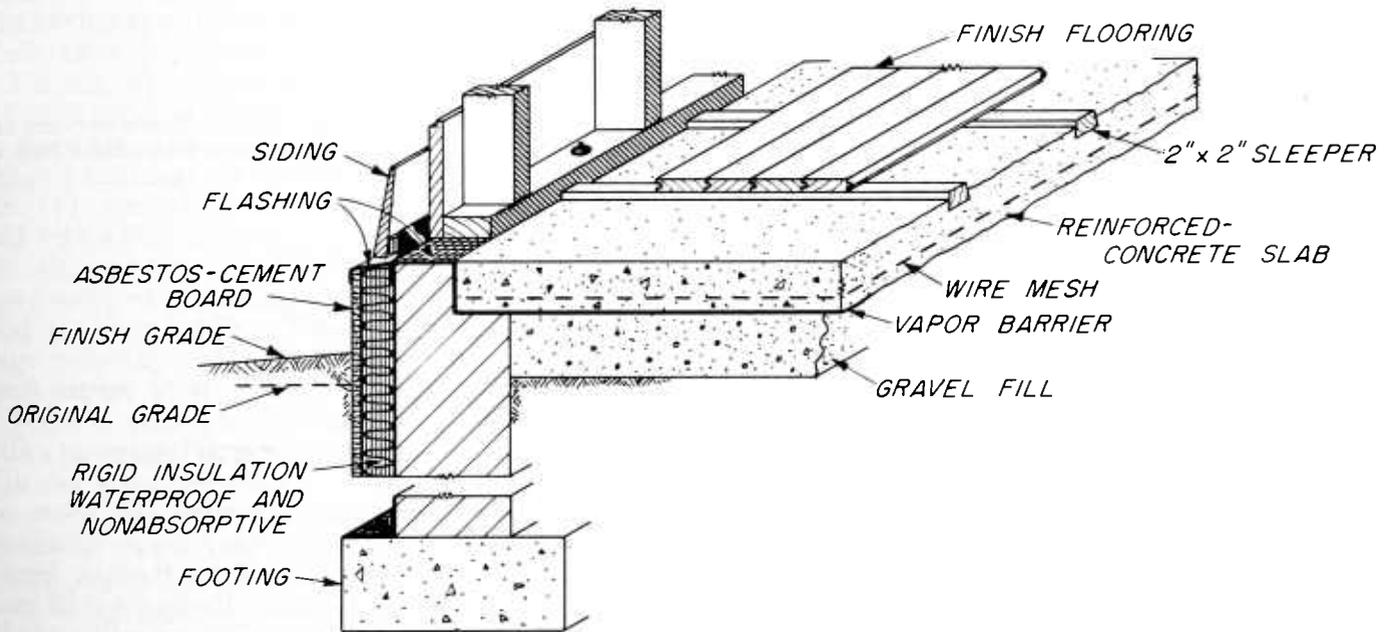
Independent slab and foundation walls. In the method of construction shown, insulation is located at the exterior surface of the wall. This method of installation may also be used on existing slab houses to minimize cold floors. One method of laying the finish floor is shown. Sleepers shown are 2 by 2 wood members impregnated with preservative and embedded in the concrete.
